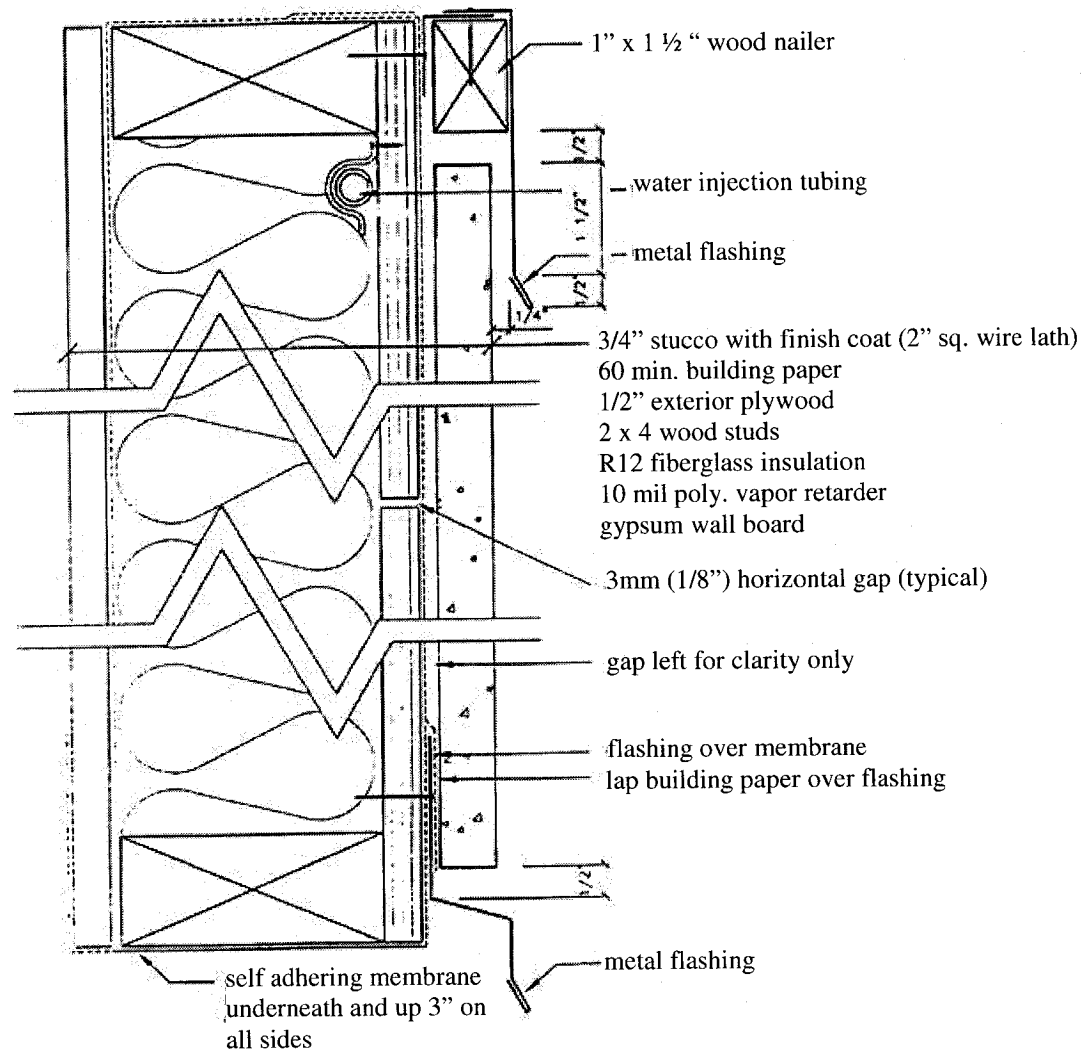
Stucco wall drying experiment. Test panel showing placement of water injection tubing (Lang *et al.*, 1999).
